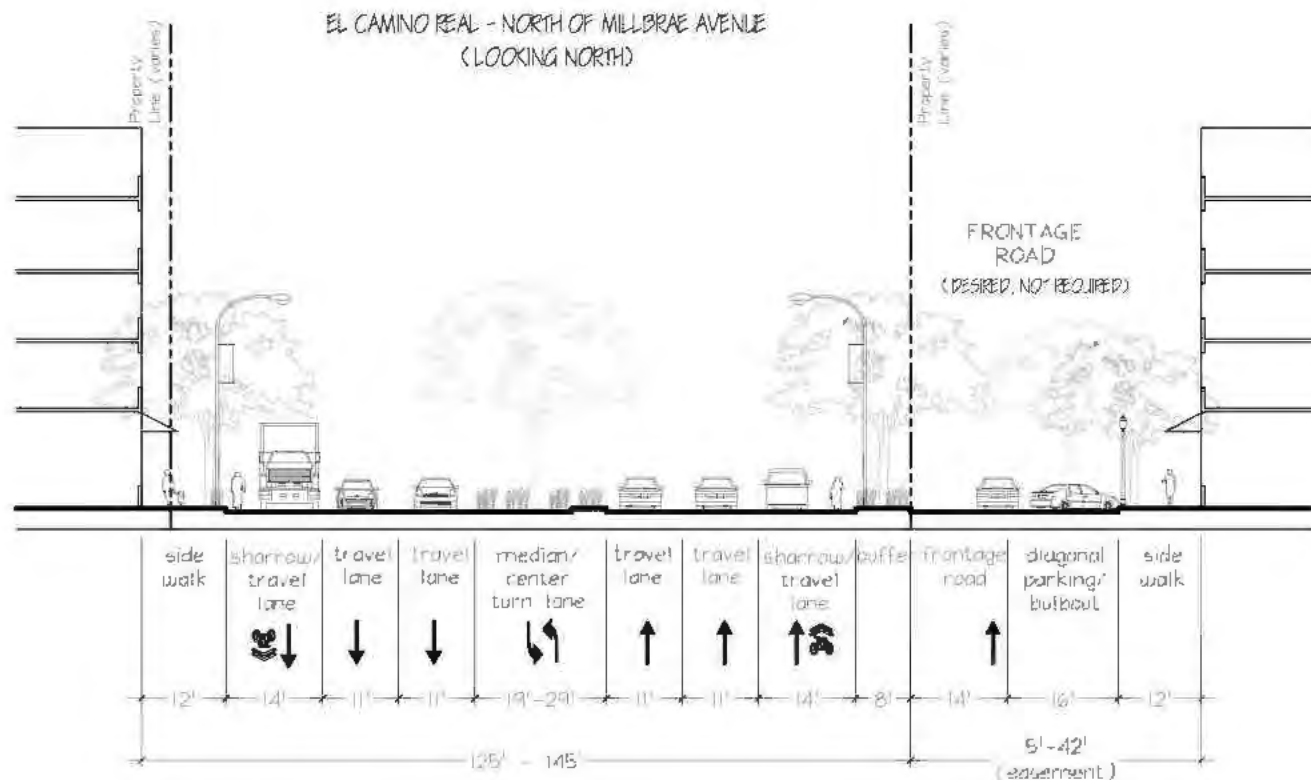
El Camino Real - North of Millbrae Avenue Typical Section
